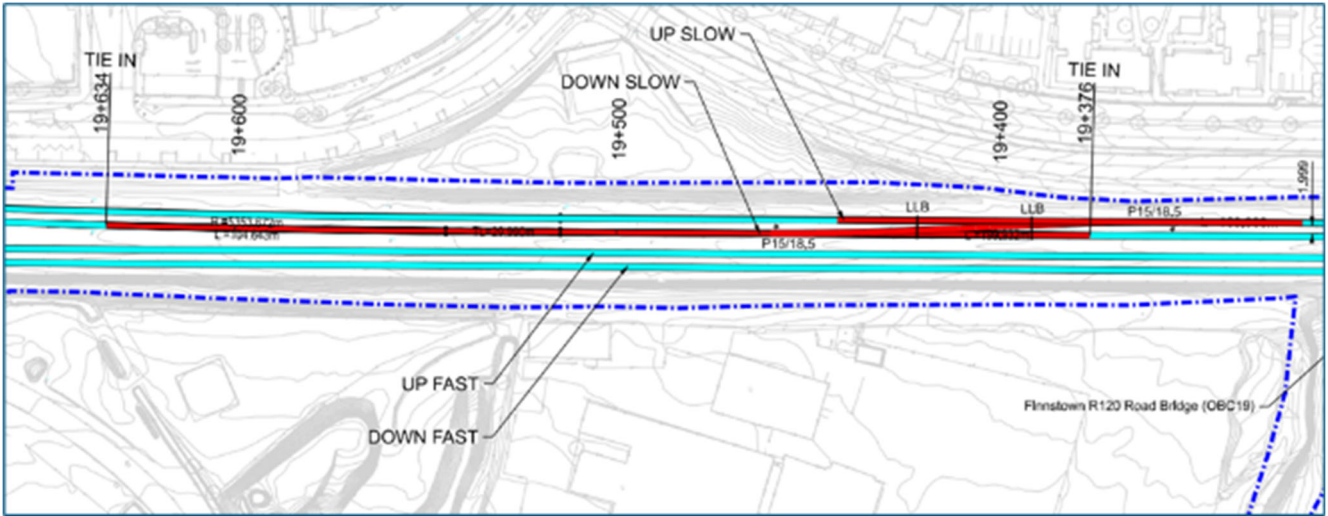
Adamstown Station- Track Plan Layout (2 of 2)
